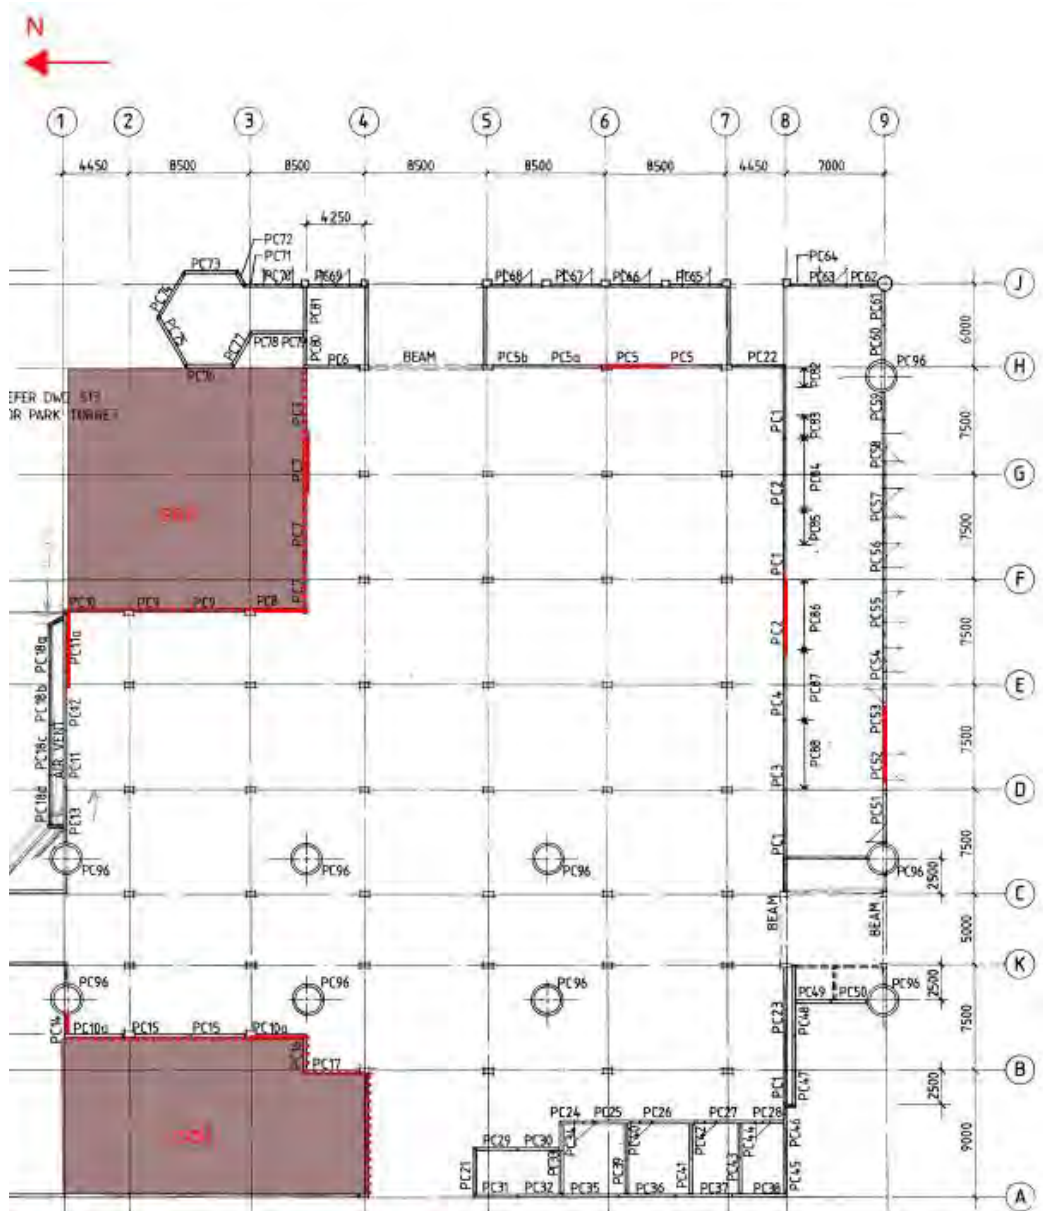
Extract of the as-built drawing S7 - showing the precast concrete wall panels around the perimeter of the structure
